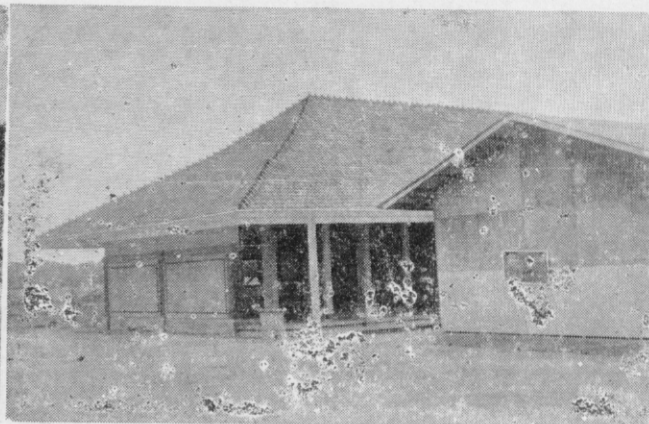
School in North Bali, Indonesia Building at left, in excellent brickwork survived July 1976 earthquake with almost on damage, Building at right, new after earthquake with braced timber frames and plywood cladding.
